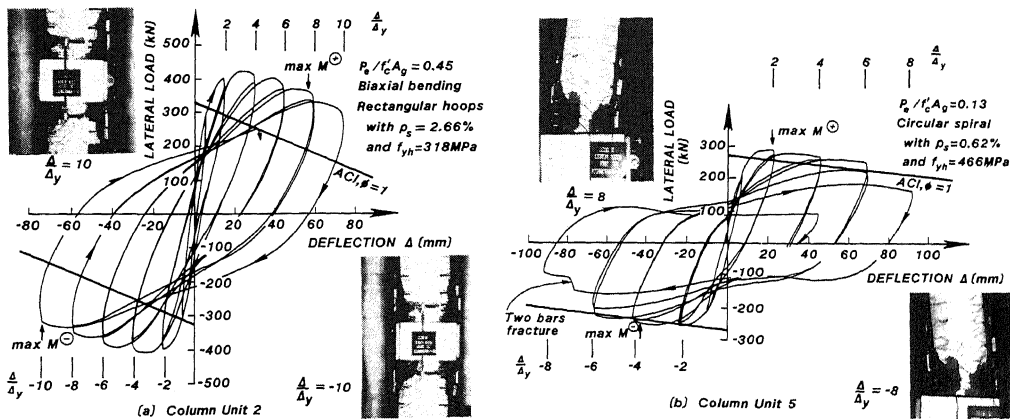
Measured Horizontal Load Versus Horizontal Deflection Hysteresis Loops and Observed Damage of Test Units.
